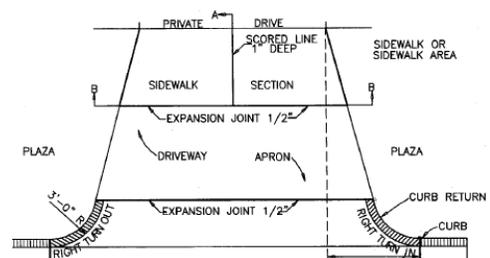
Wilmington standard driveway detail (SD 8-02)
